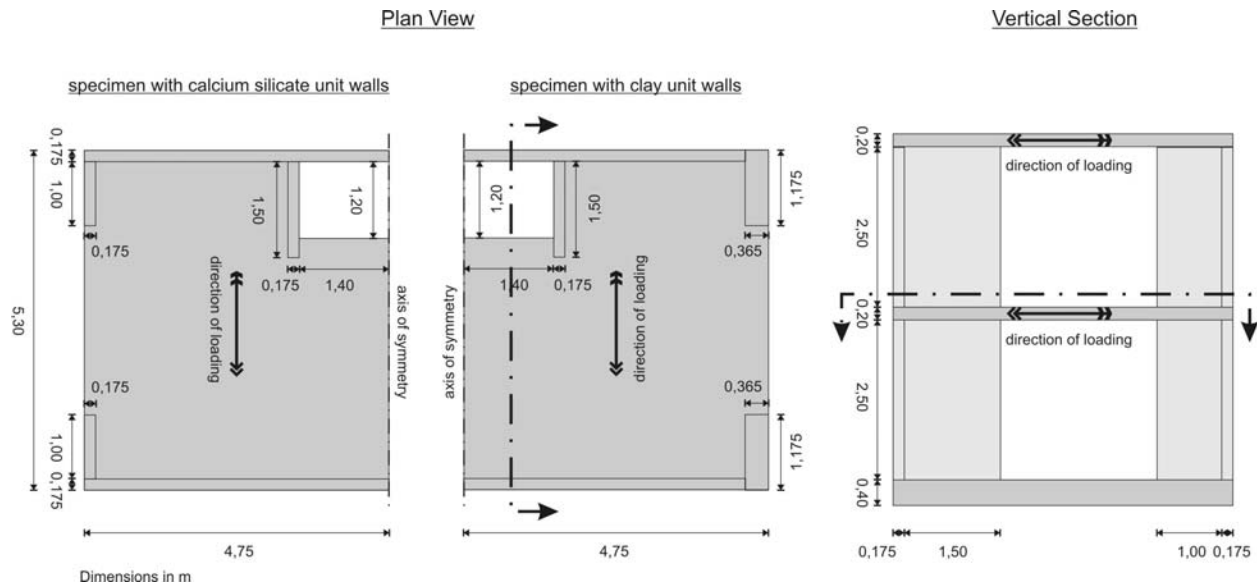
Ground plan and elevation of the two storey specimens tested in Ispra [10,13]
